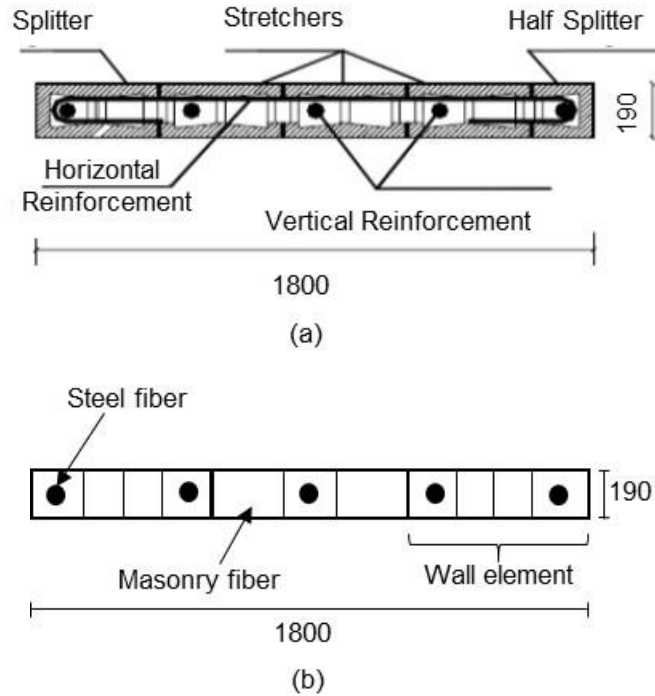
(a) Cross-section of specimens; (b) Fiber sections
